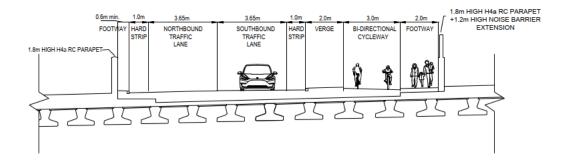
Typical highway cross sections over Appleford Siding Bridge
